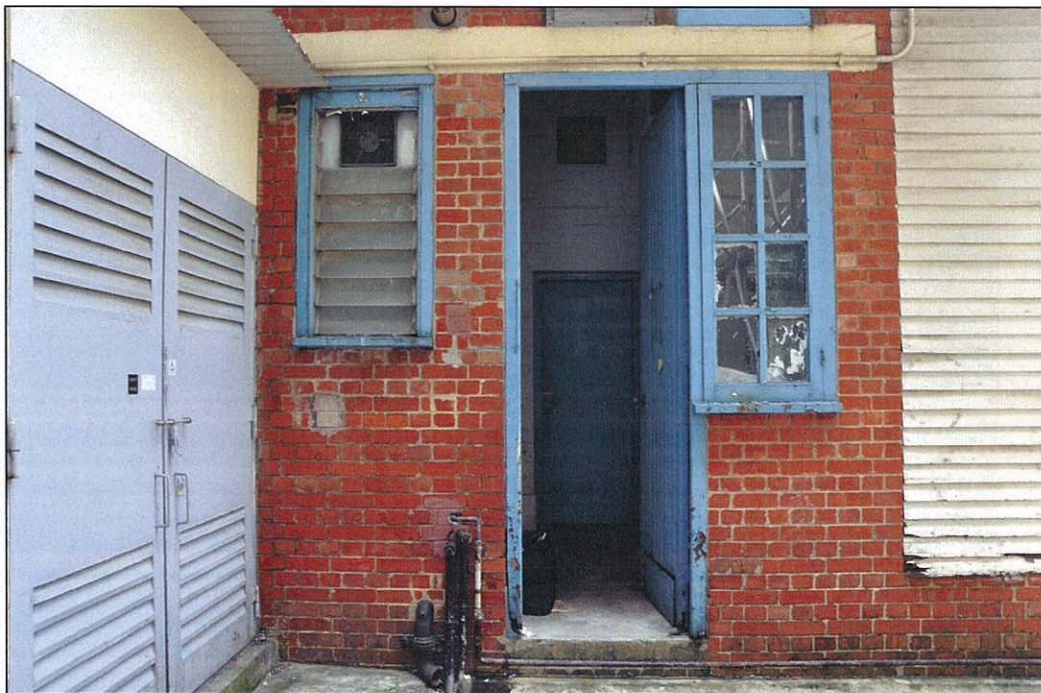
North side external wall, rear part entrance to store room (2011/08/13)
